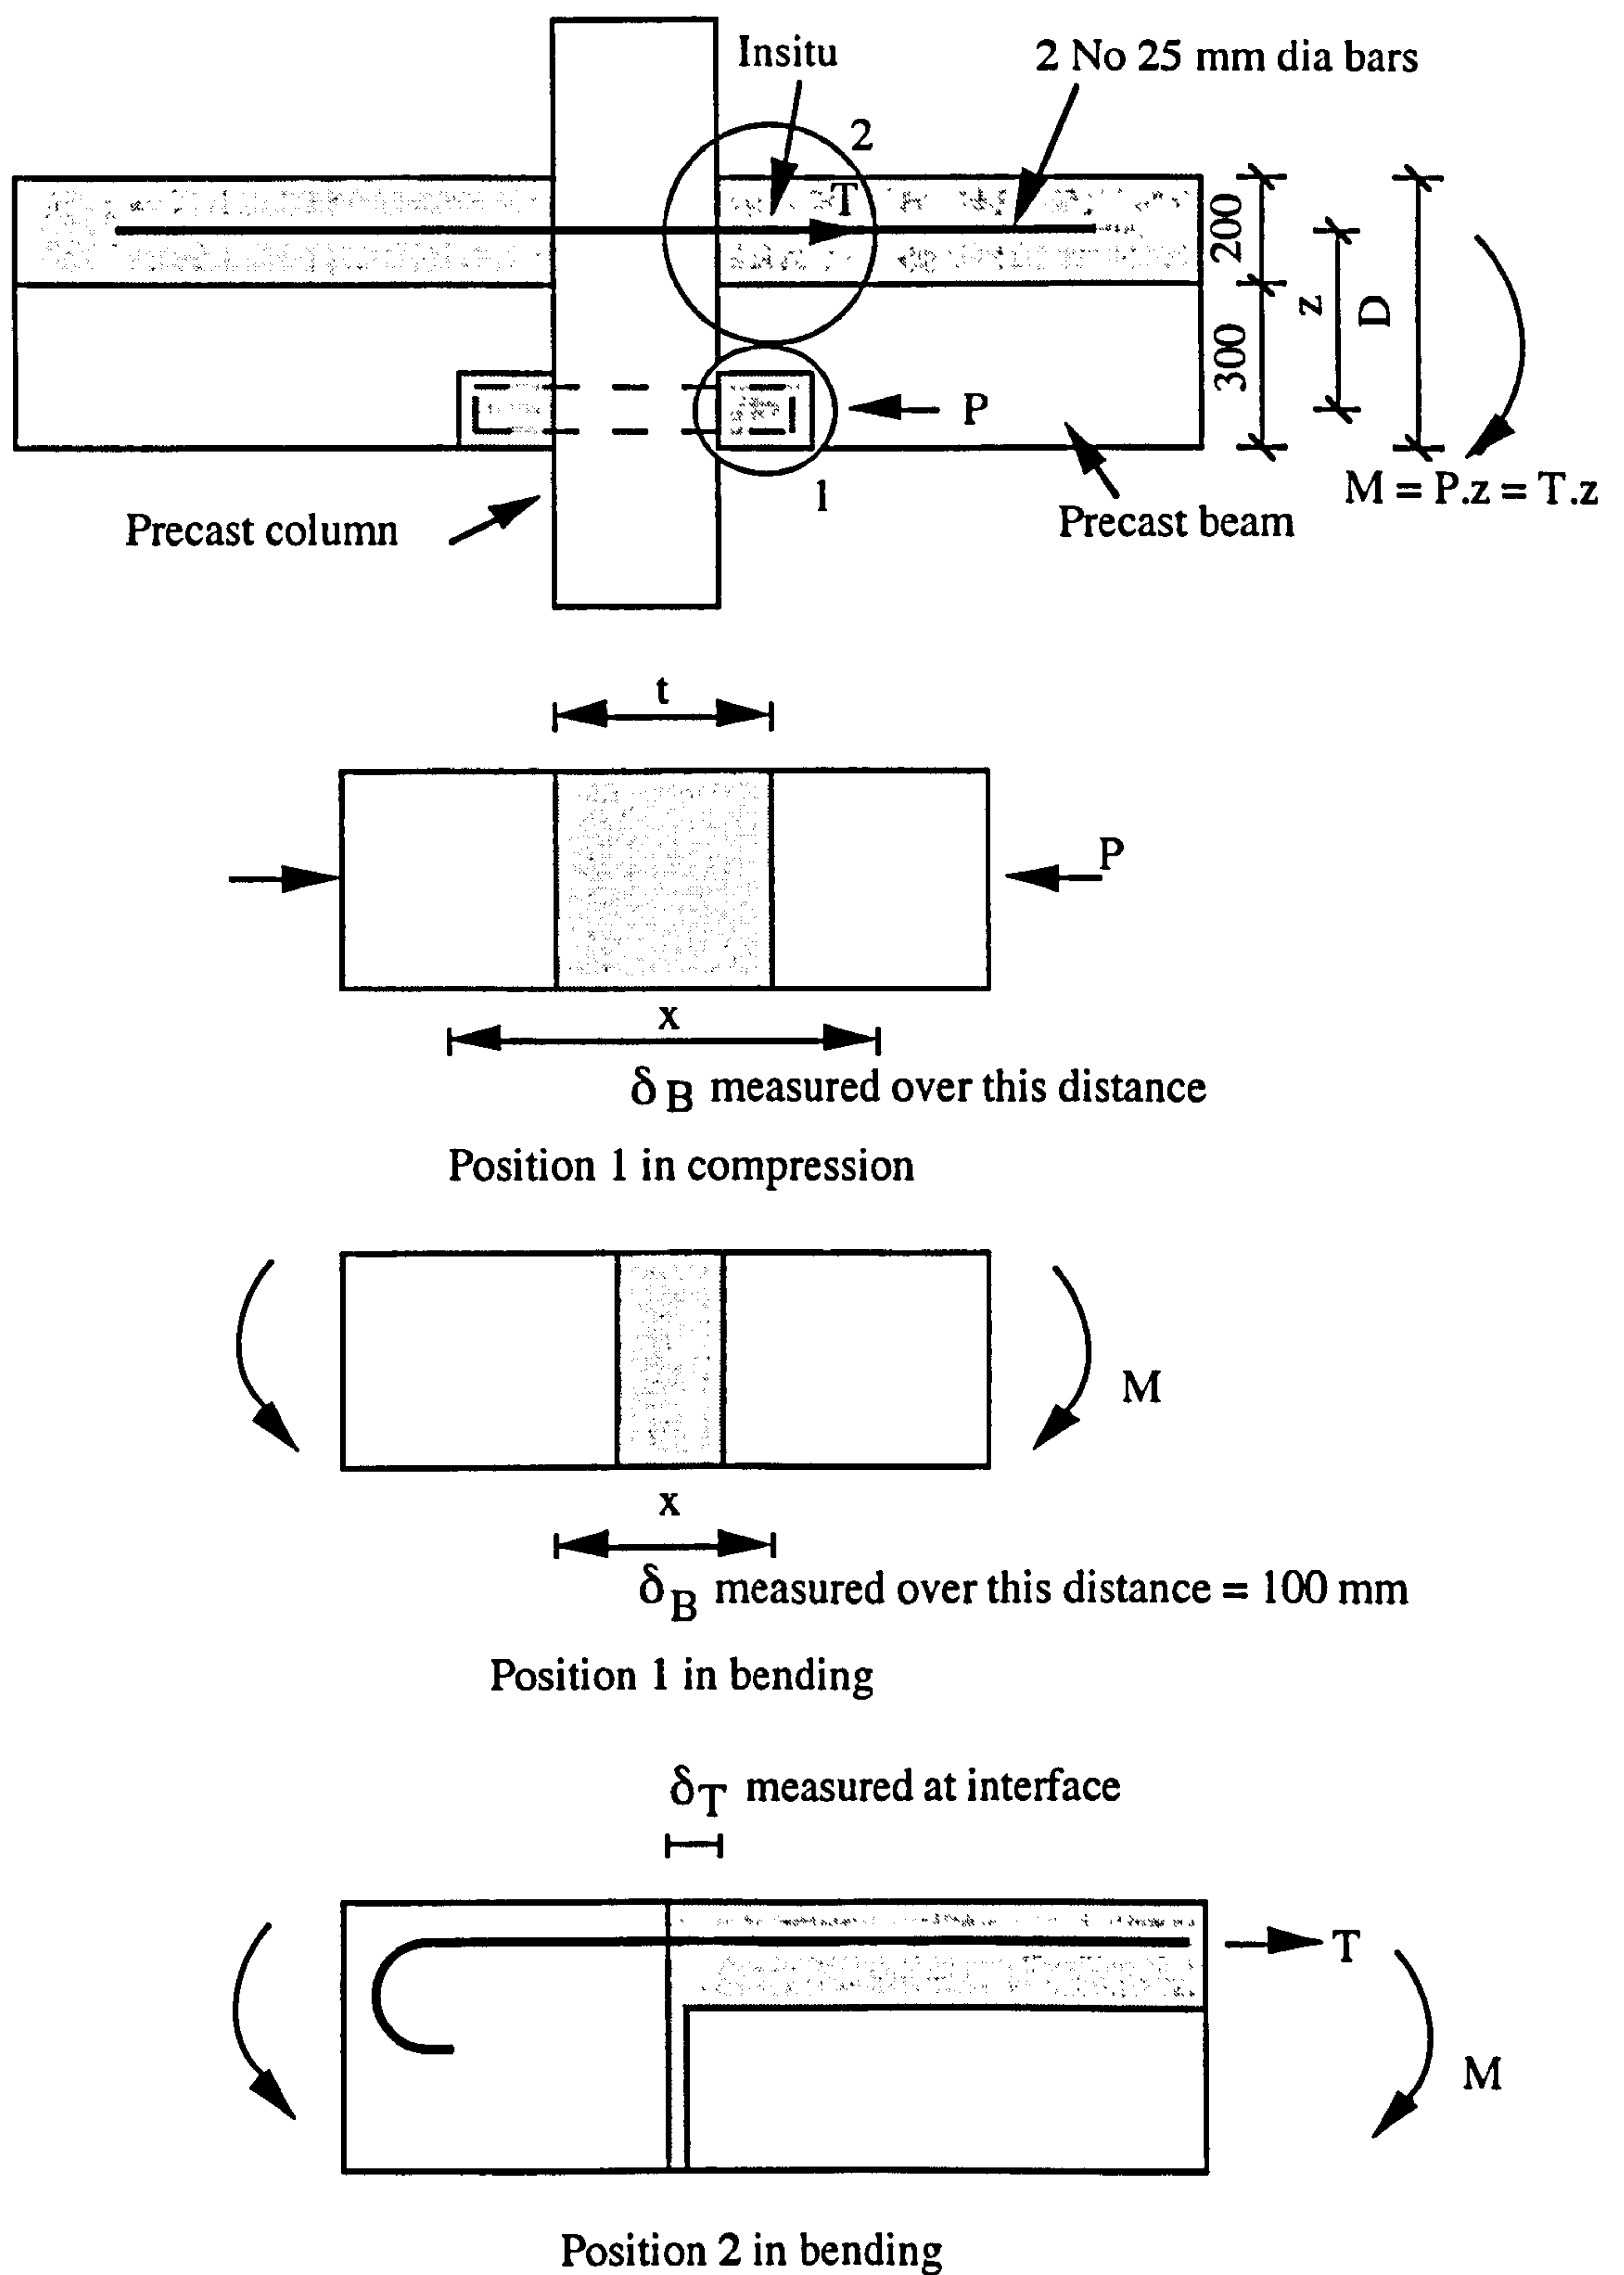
Sub-sections of beam-column connection used in simplified model
